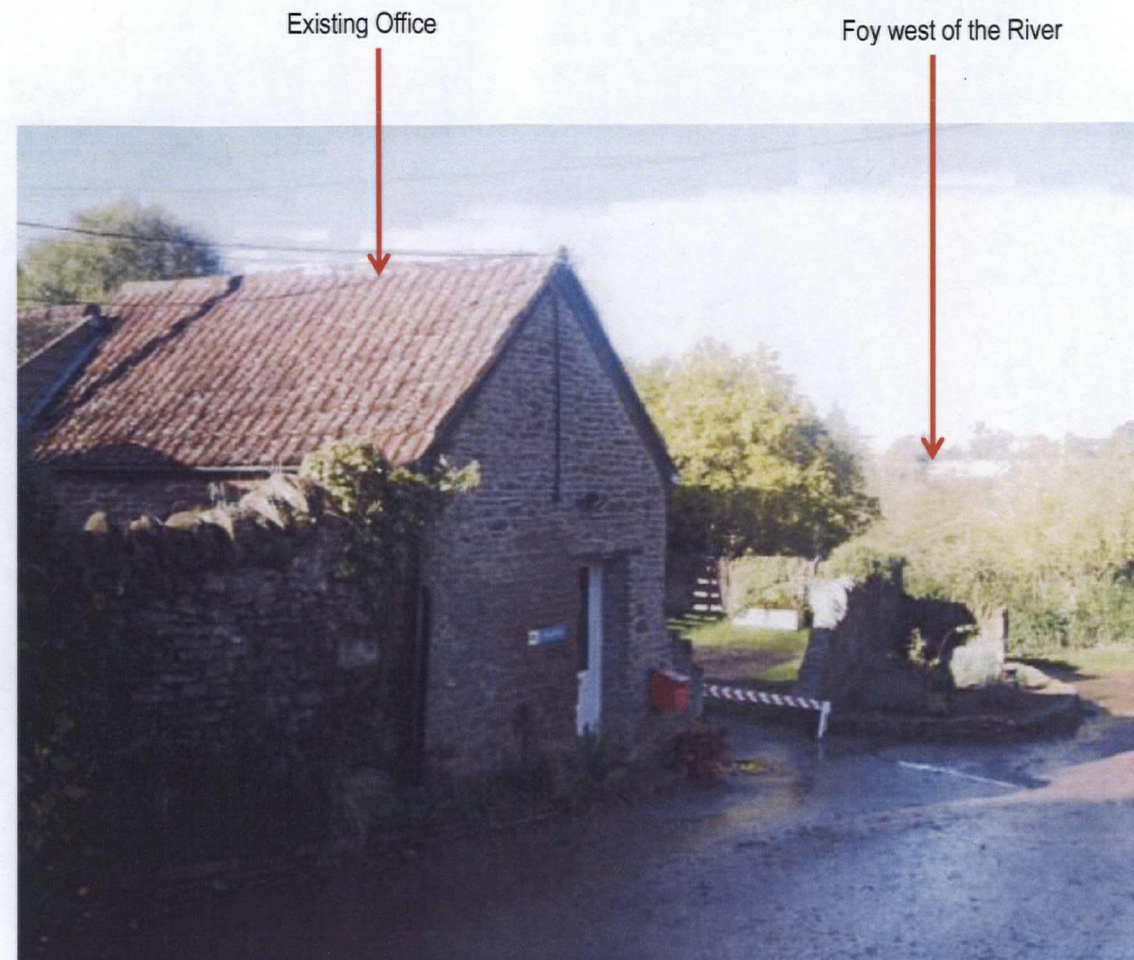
looking west along the approach to Court Farm with stone retaining wall
